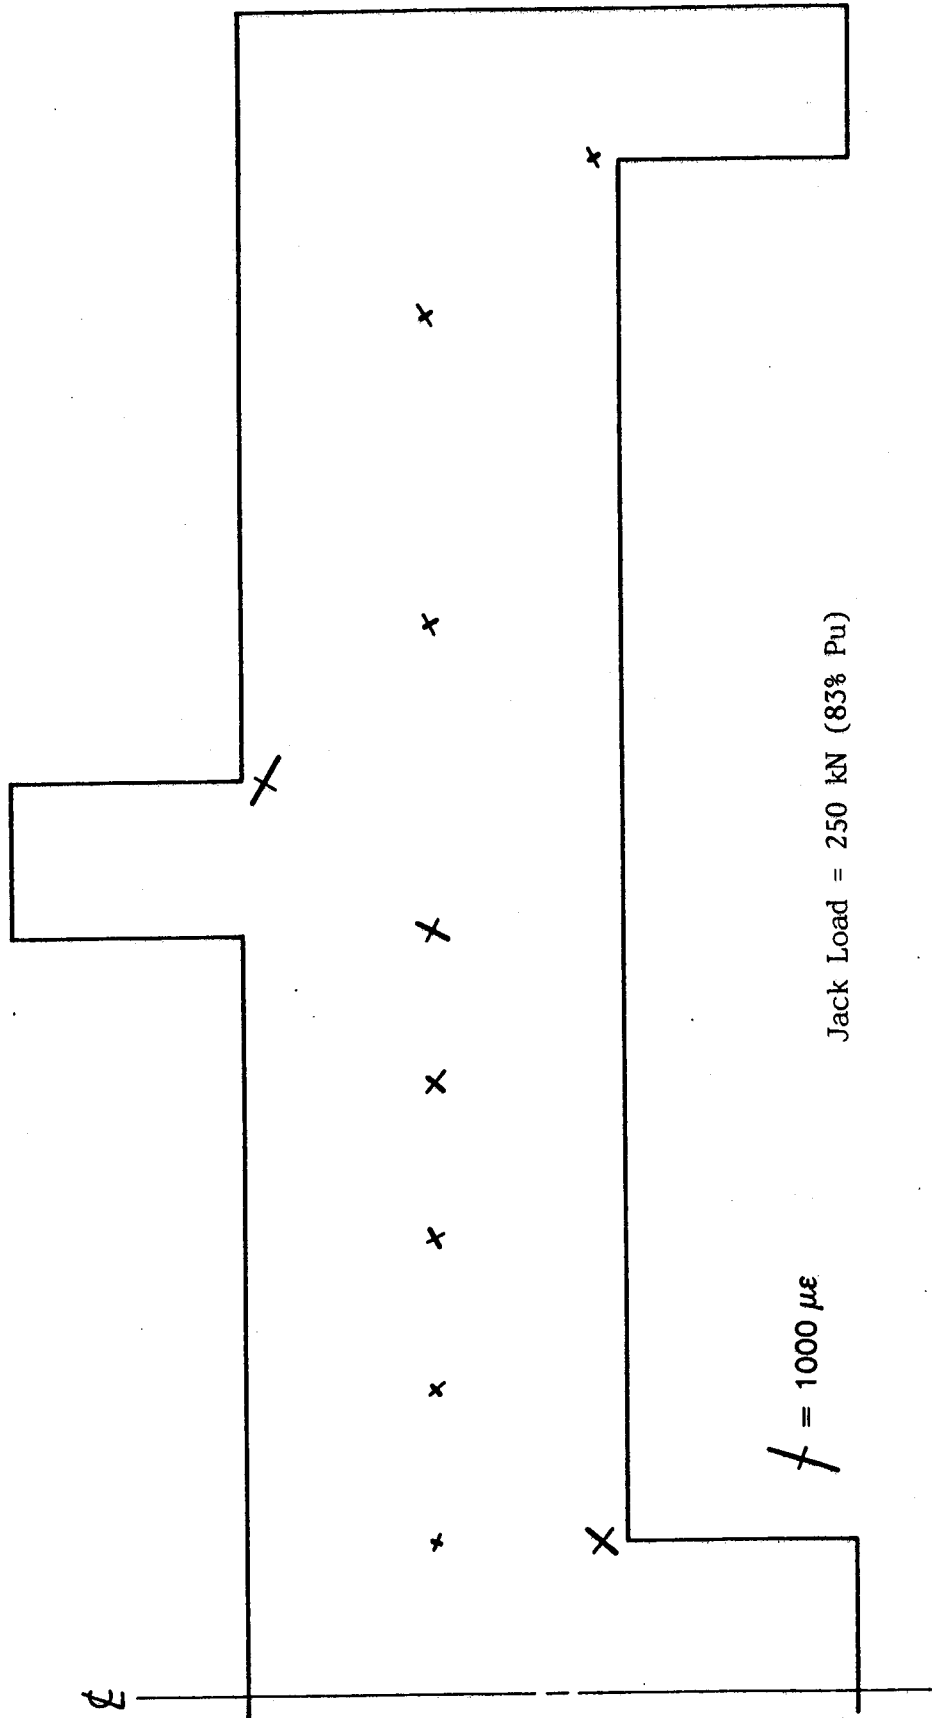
Beam 6/2.0 Concrete Compressive Strains
